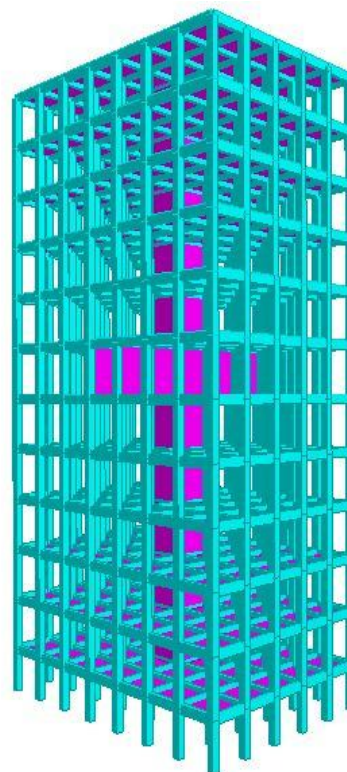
Actual 3D view of case (RA3) Residential Apartment with shear core and wall outriggers after rendering
